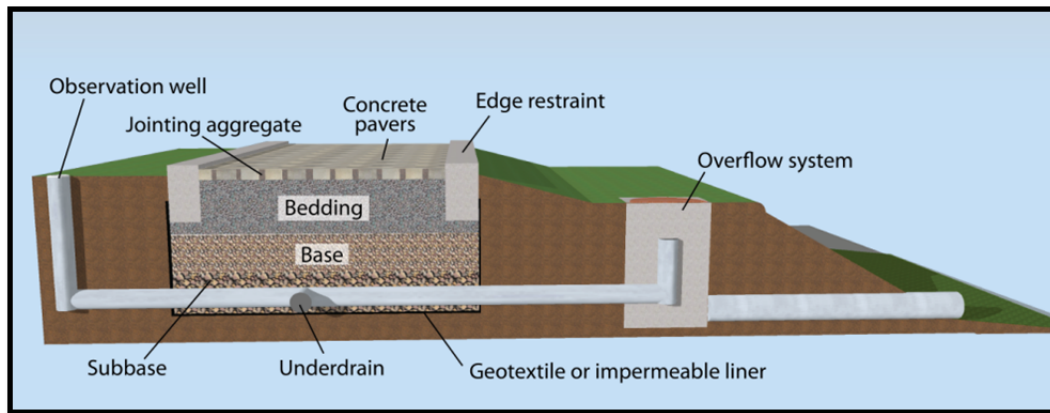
A Cross Section of a Permeable Interlocking Concrete Paver Installation
